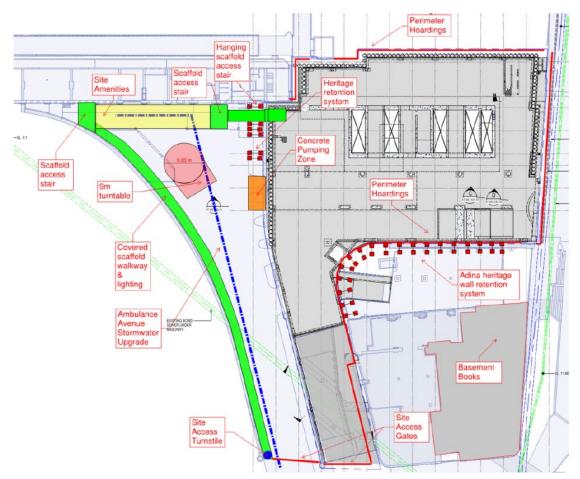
Site plan showing locations of hoarding and scaffolding.
